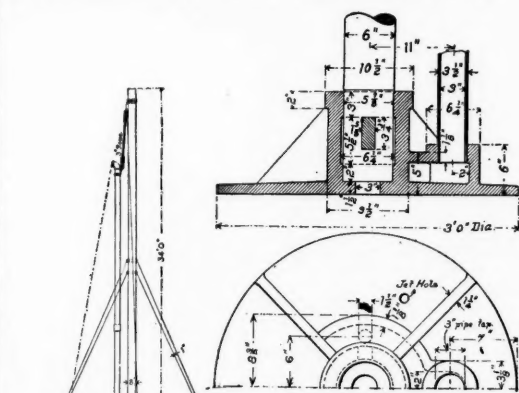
Sectional Elevation and Half Plan of Disk, Pile and Jet Pipe.
